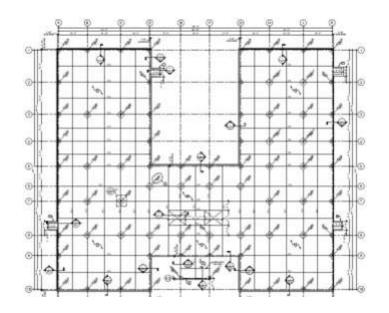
First Floor Slab Plan (Image Credit: Larson Design Group)
